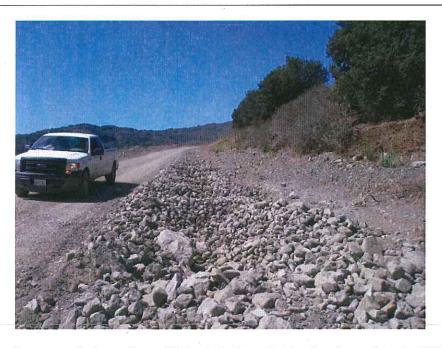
Non-limestone drainage channel/French drain on inside of main roadway in EMSA looking south. Drain discharges into channel shown in Photo 16. Dated September 3, 2015.
